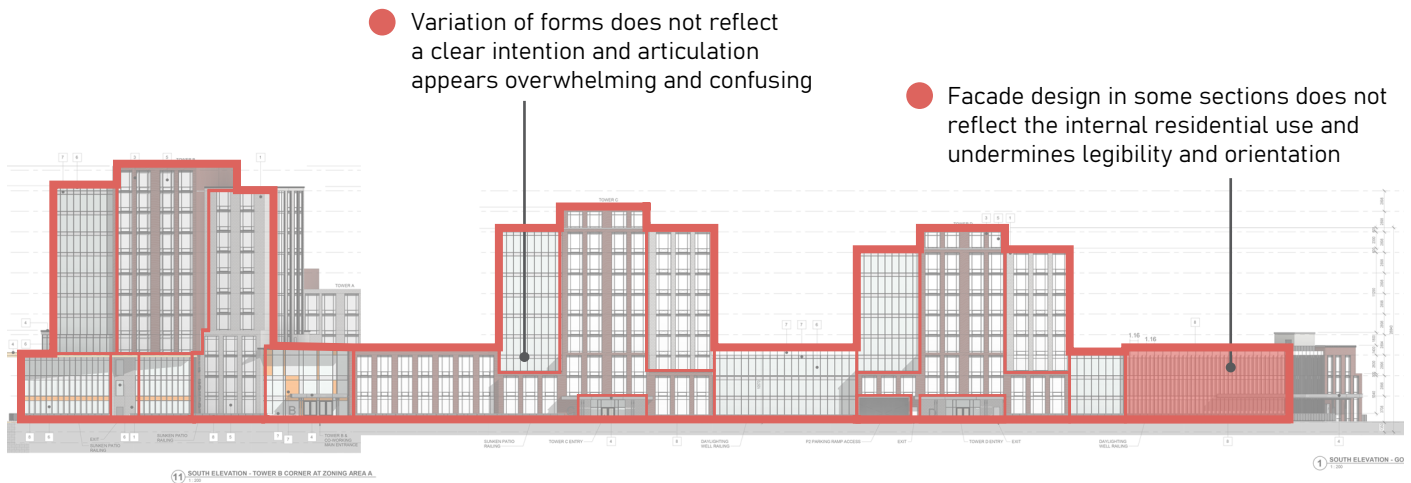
Facade design and articulation analysis - Front Elevation facing Gordon Street- Part I
